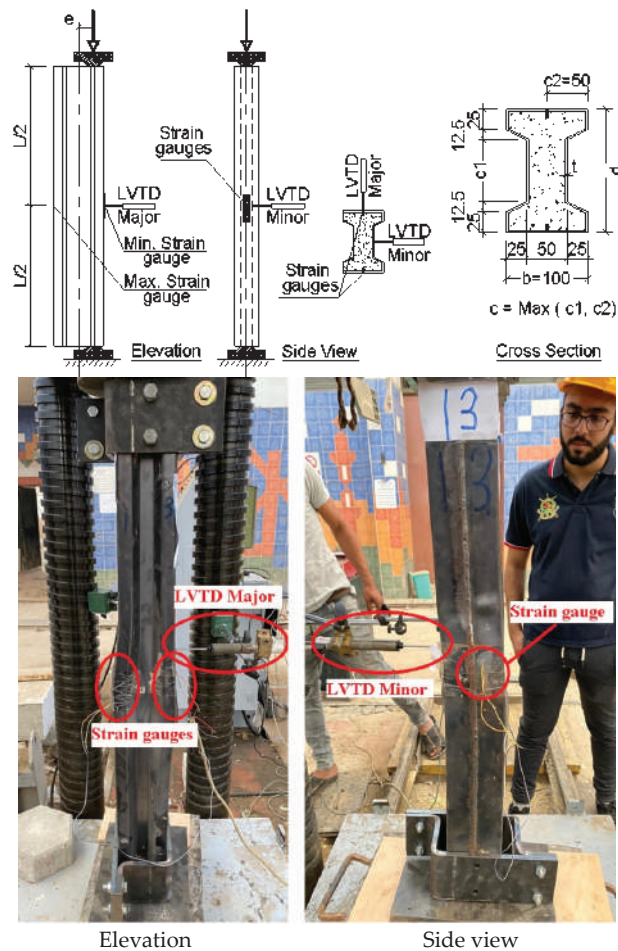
Testing setup, instrumentation and typical dimensions of specimen cross section.
